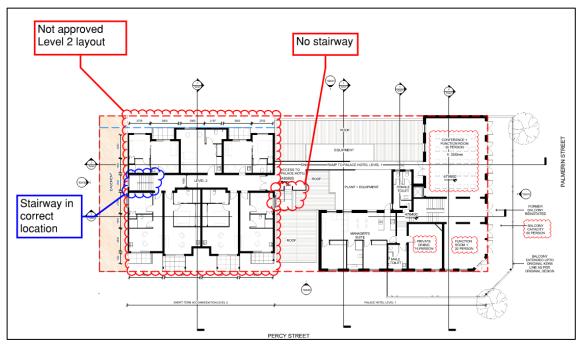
Floor Plan - Proposed Level 2 (Room/unit layout incorrect) (Amended by Council 19 August 2024)
